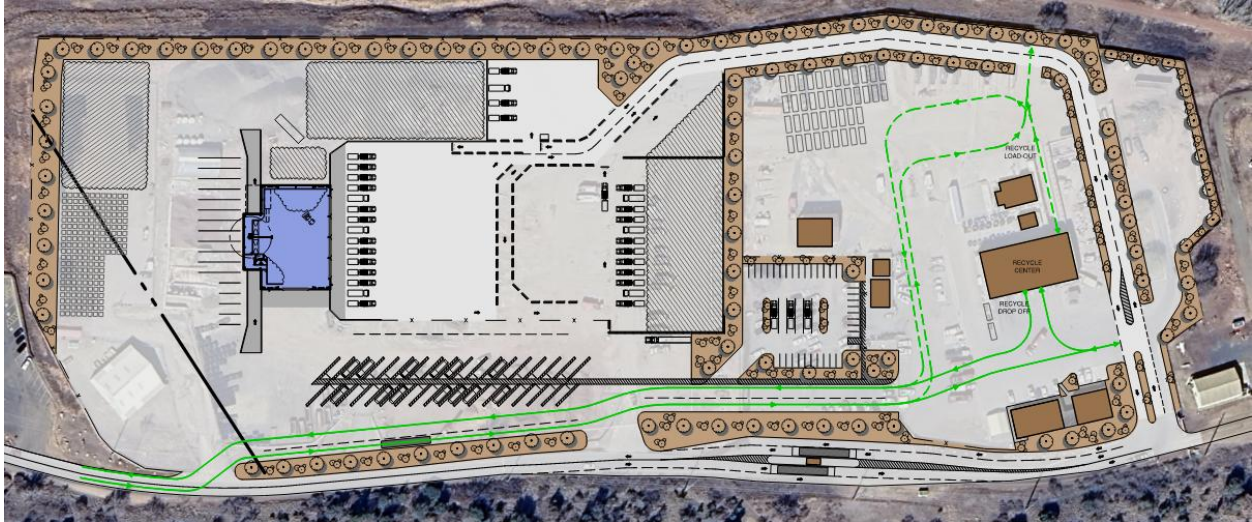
Traffic Flow On-site for Recycling Collections
